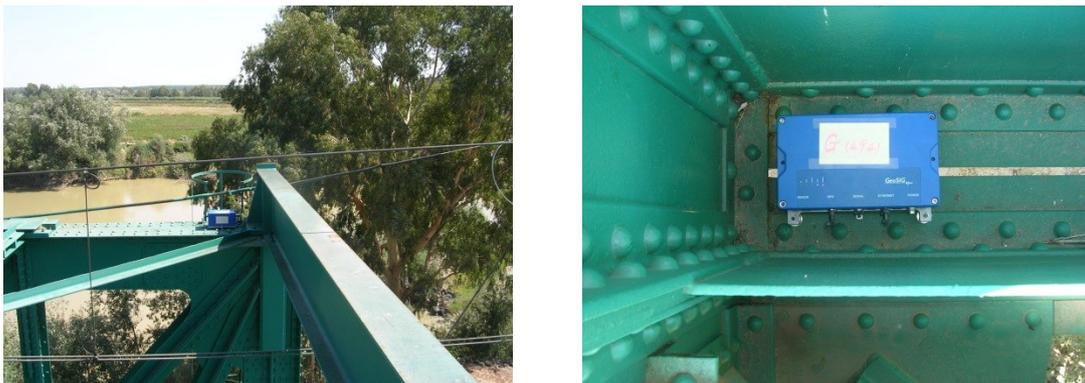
Placement of sensor units at the top and bottom nodal joints of the bridge
